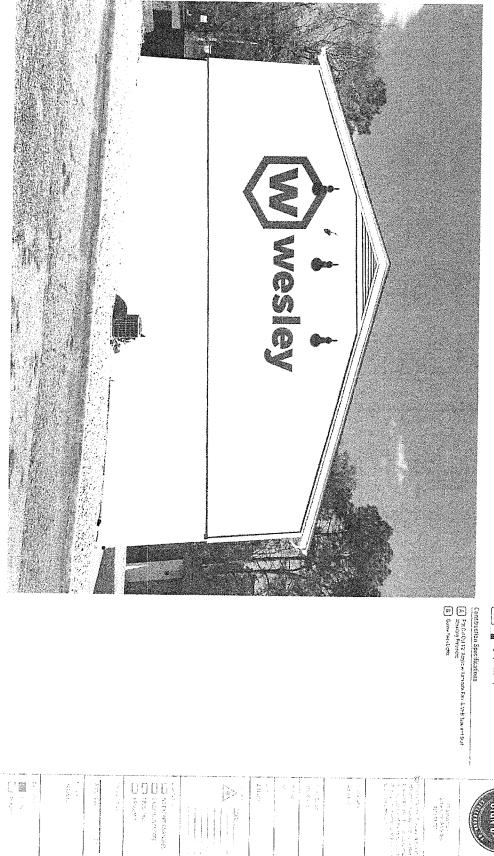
EXHIBIT E (CONT'D): PROPOSED SIGNAGE PLANS
